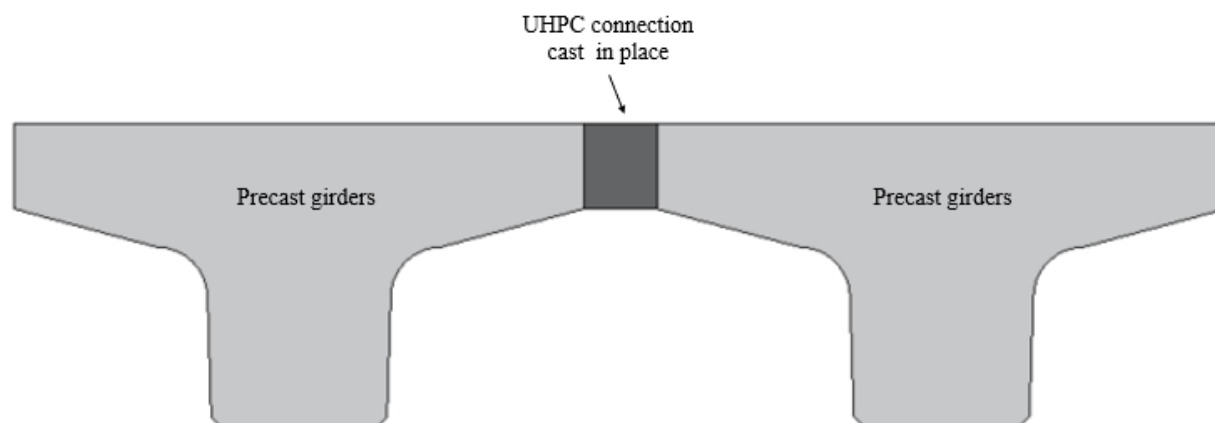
Compact precast prestressed HPFRC girders cross section with UHPC longitudinal field connection (adapted from Rachello, 2023)
